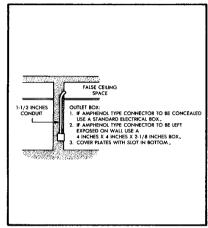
Typical Ceiling Distribution System Using Conduit to Telephone Zones
